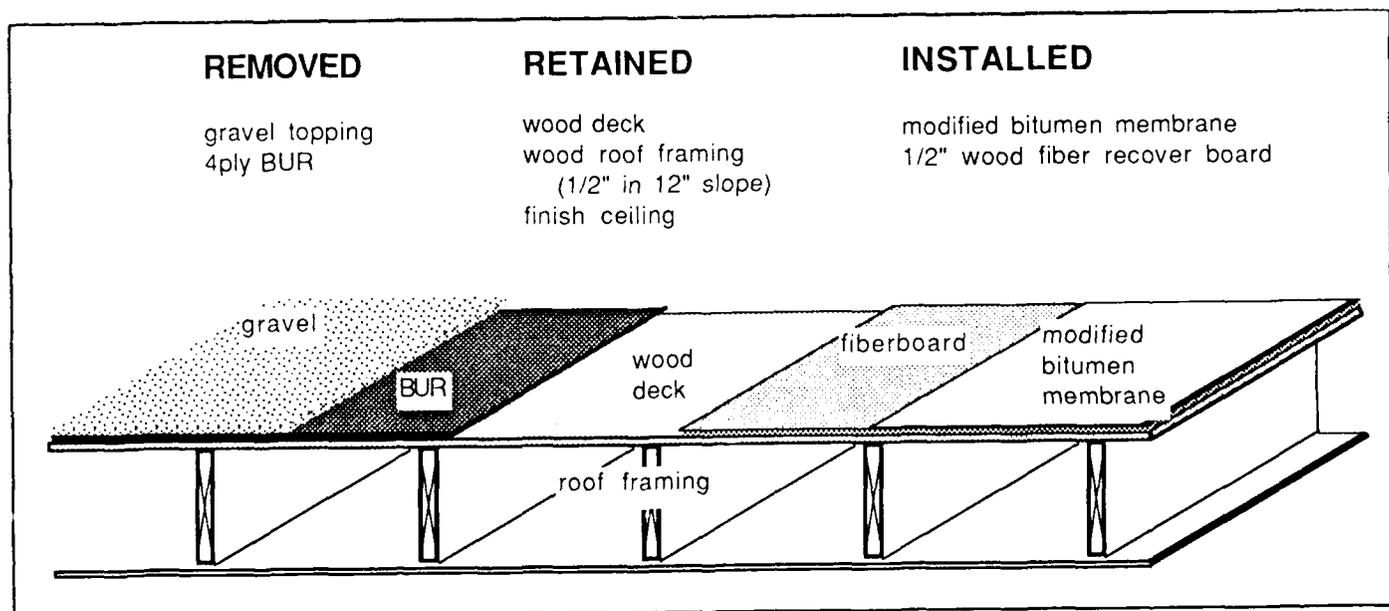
Schematic of self-adhering modified bitumen installed over wood deck.
